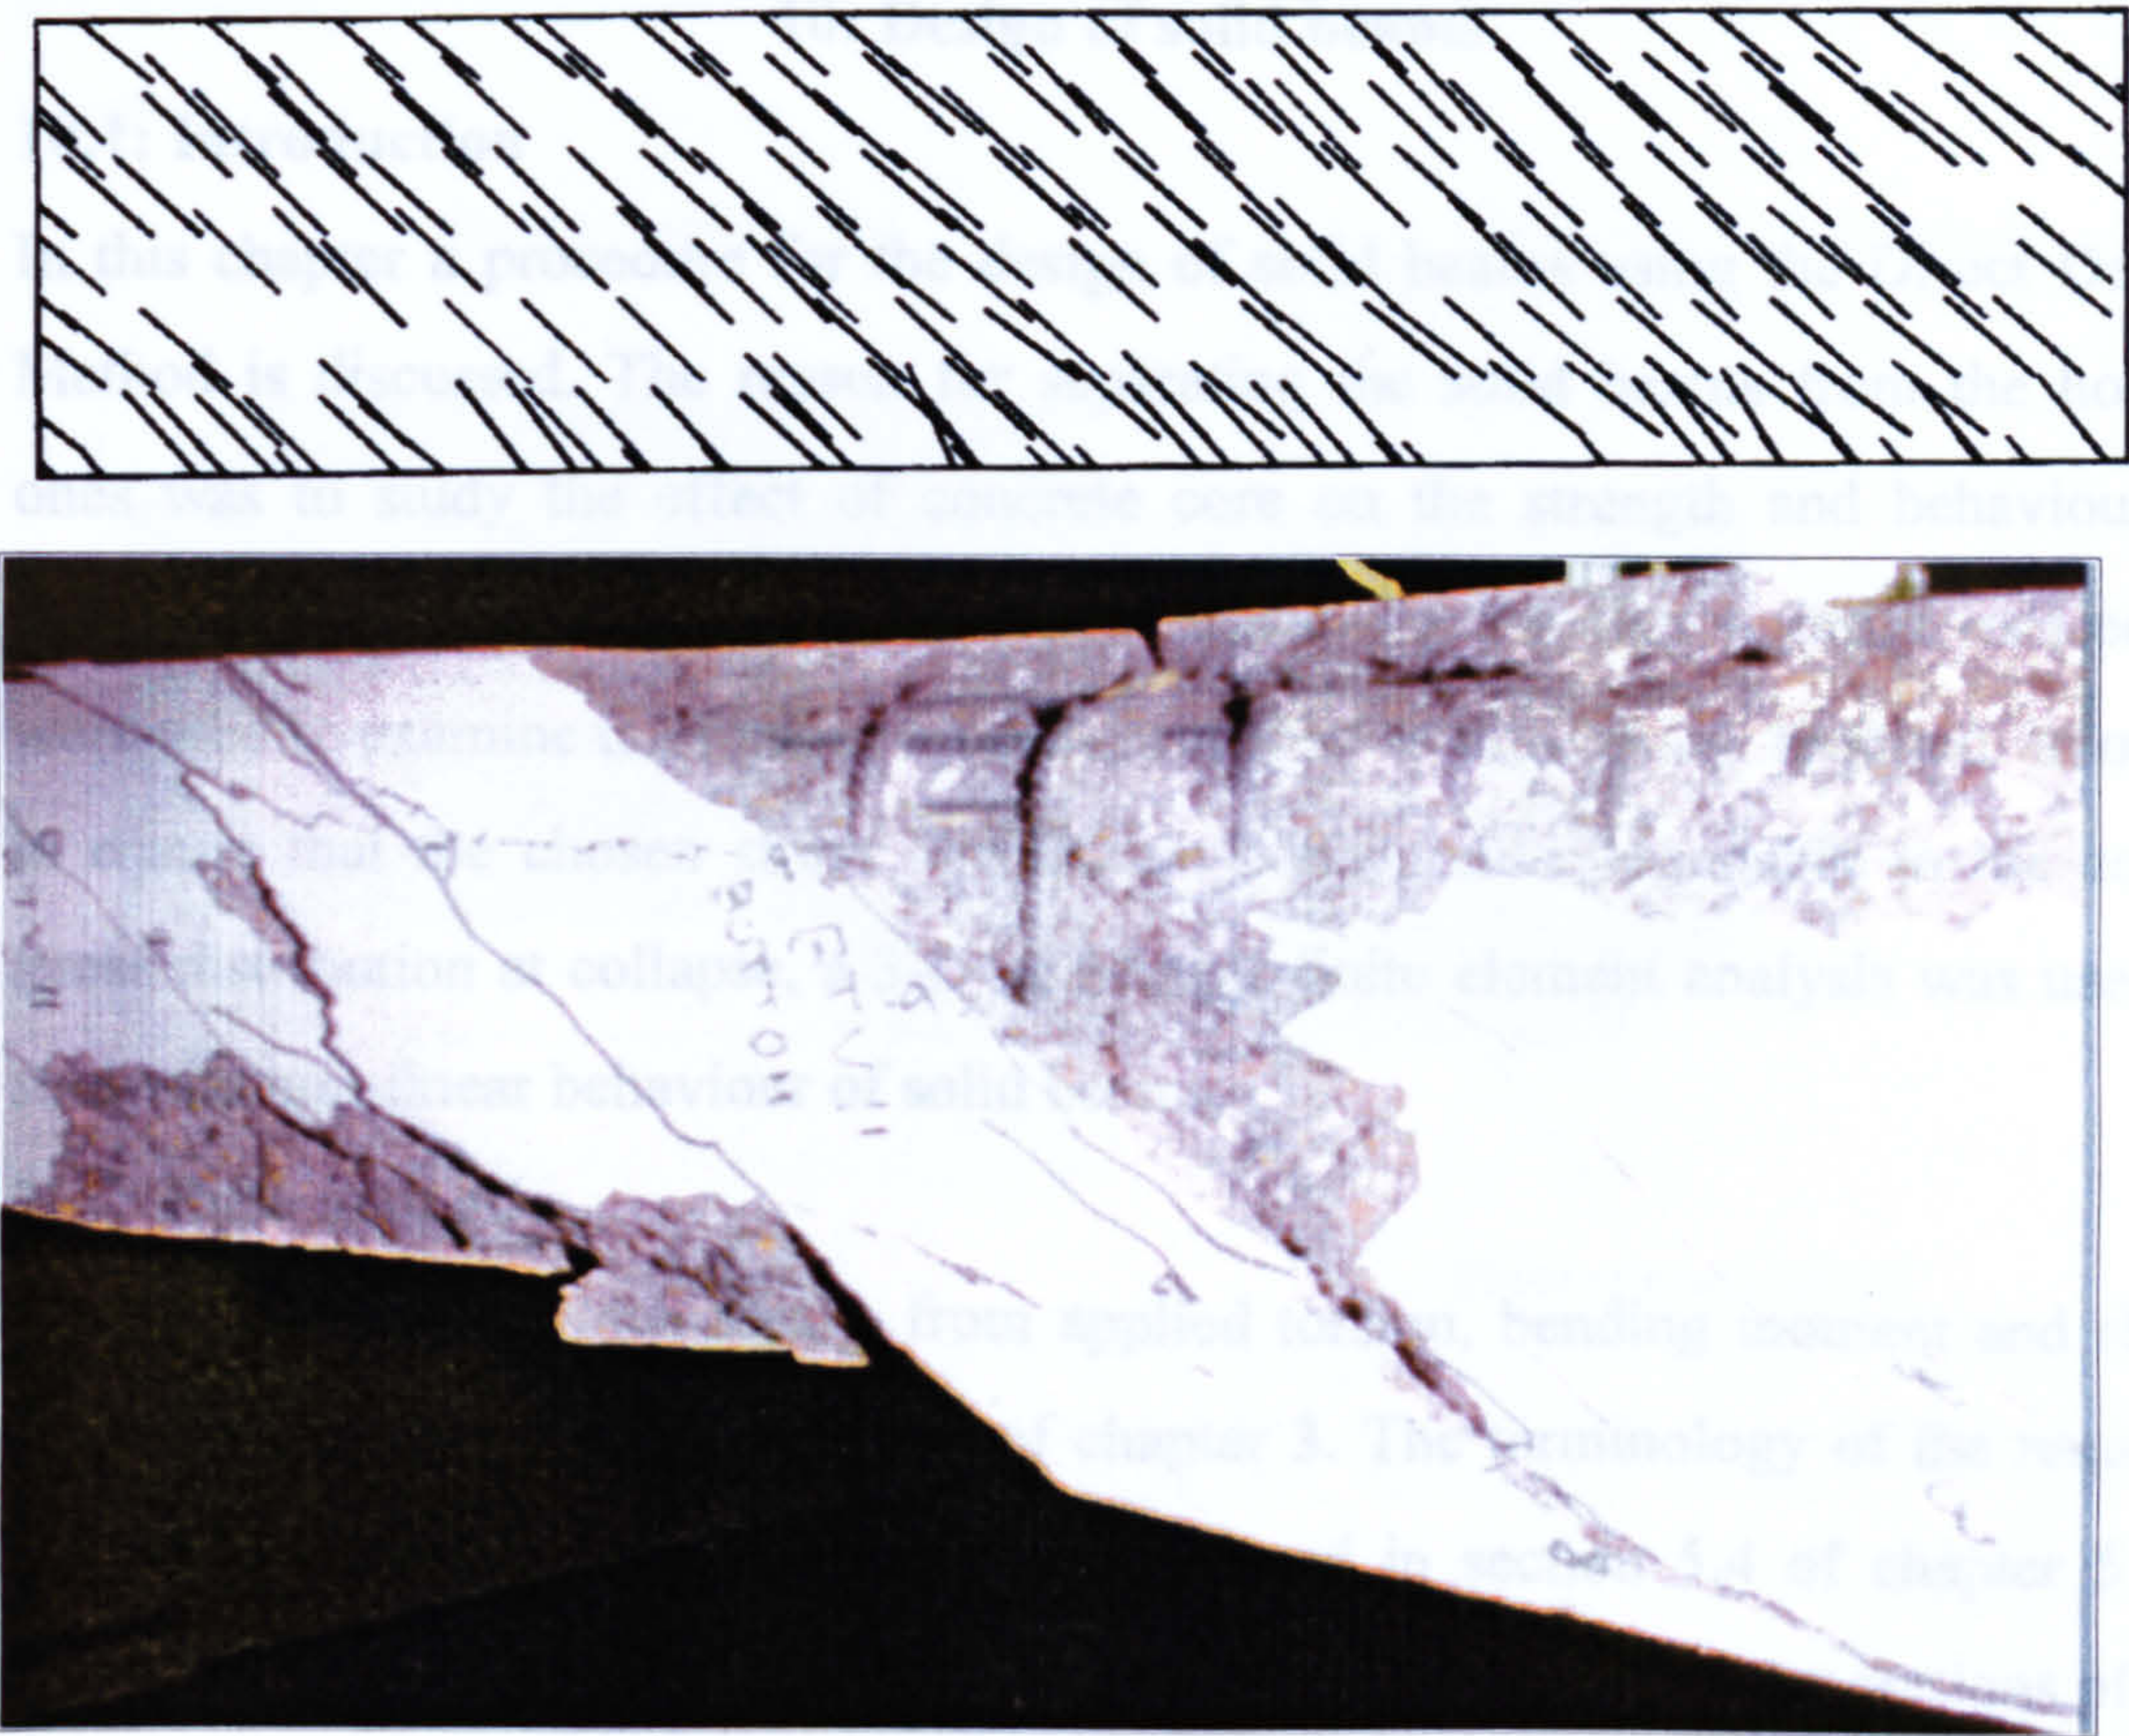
Crack development in the bottom flange (BTV11)
